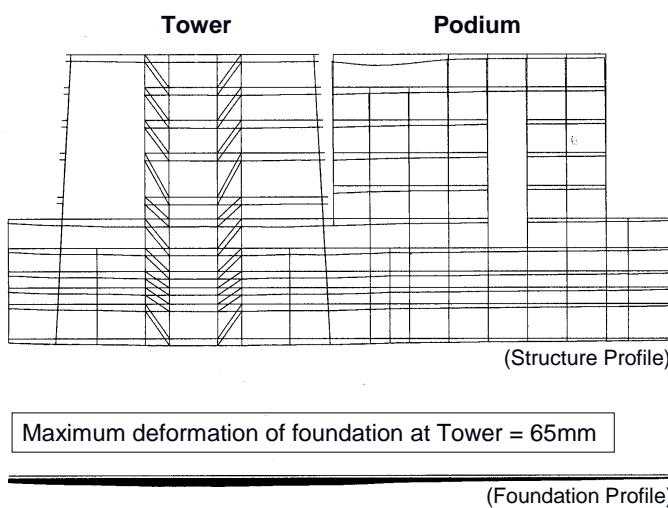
Foundation settlement calculated by structure-foundation-subsoil interaction (under sustained load at low groundwater level)
